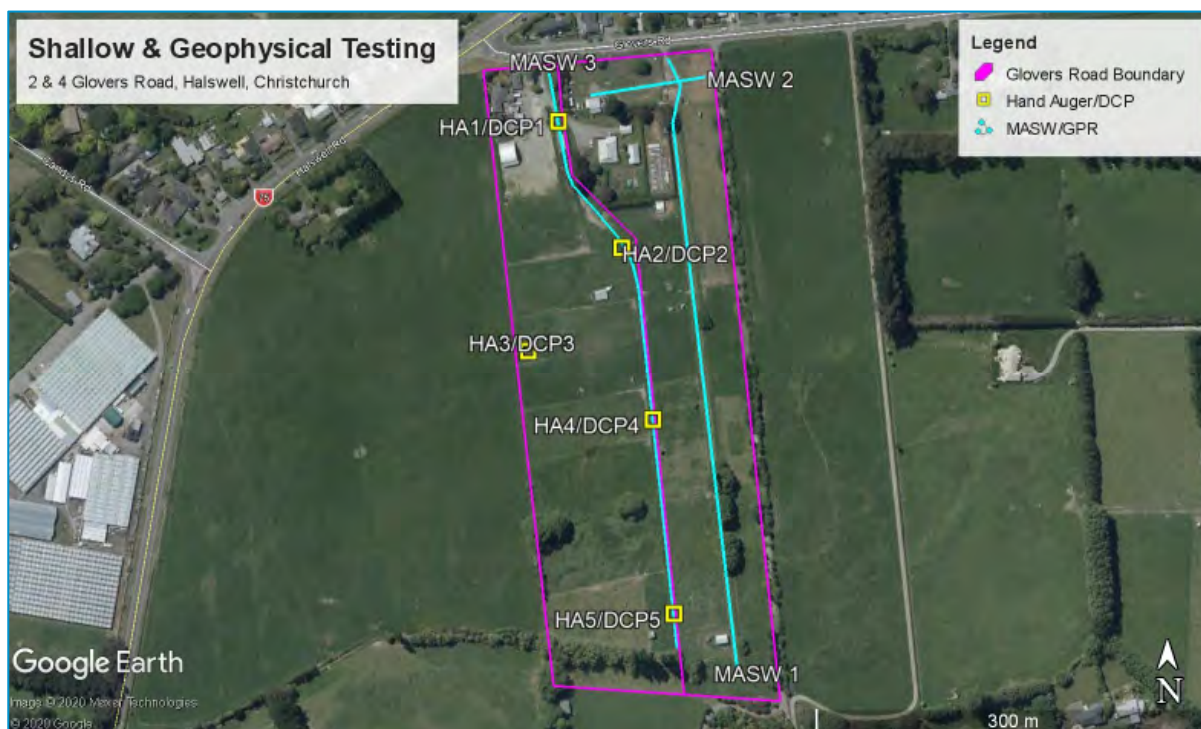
Other Geotechnical Investigation Location Plan (Scale as Shown)
